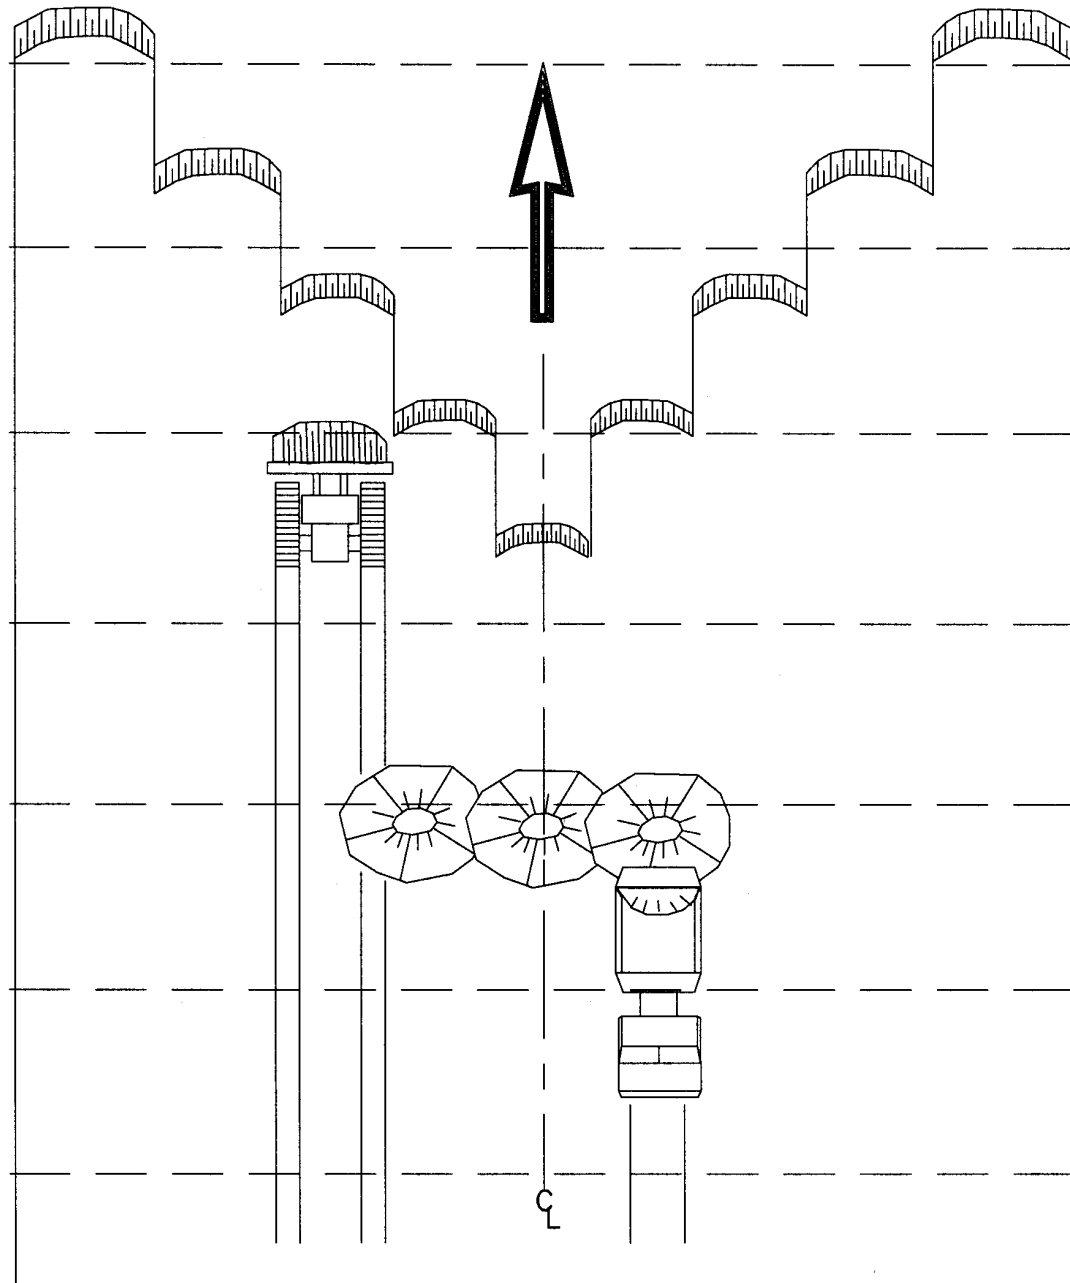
Placement of fill between toe berms on extremely soft foundations (CBR < 1) with a mud wave anticipated
